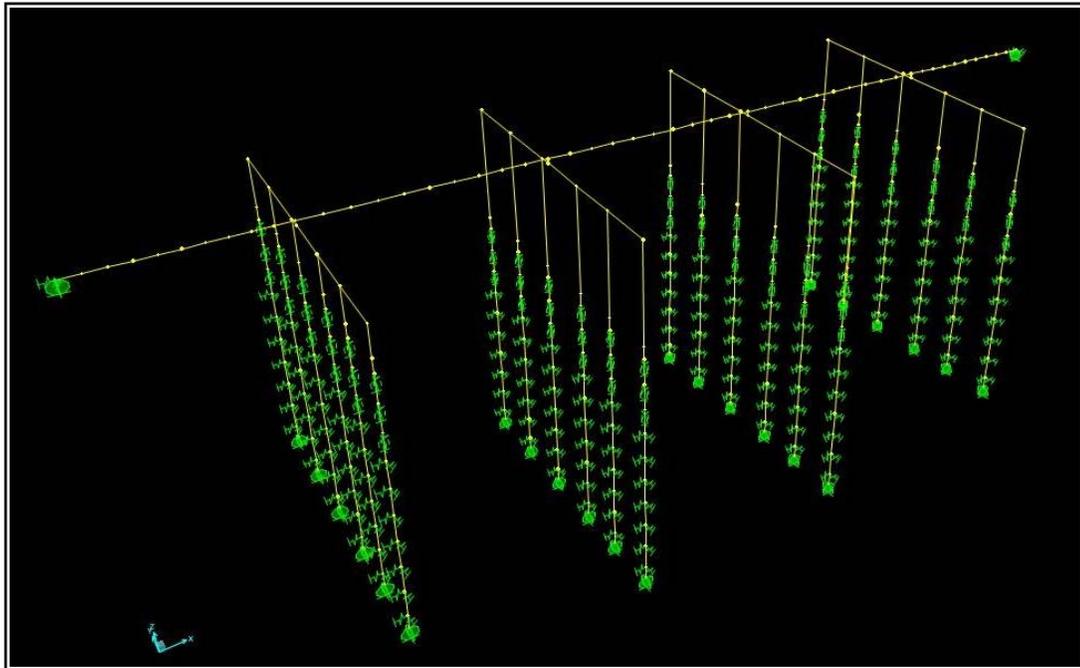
SAP2000 Model of Bridge Structure with Soil-Pile Springs
